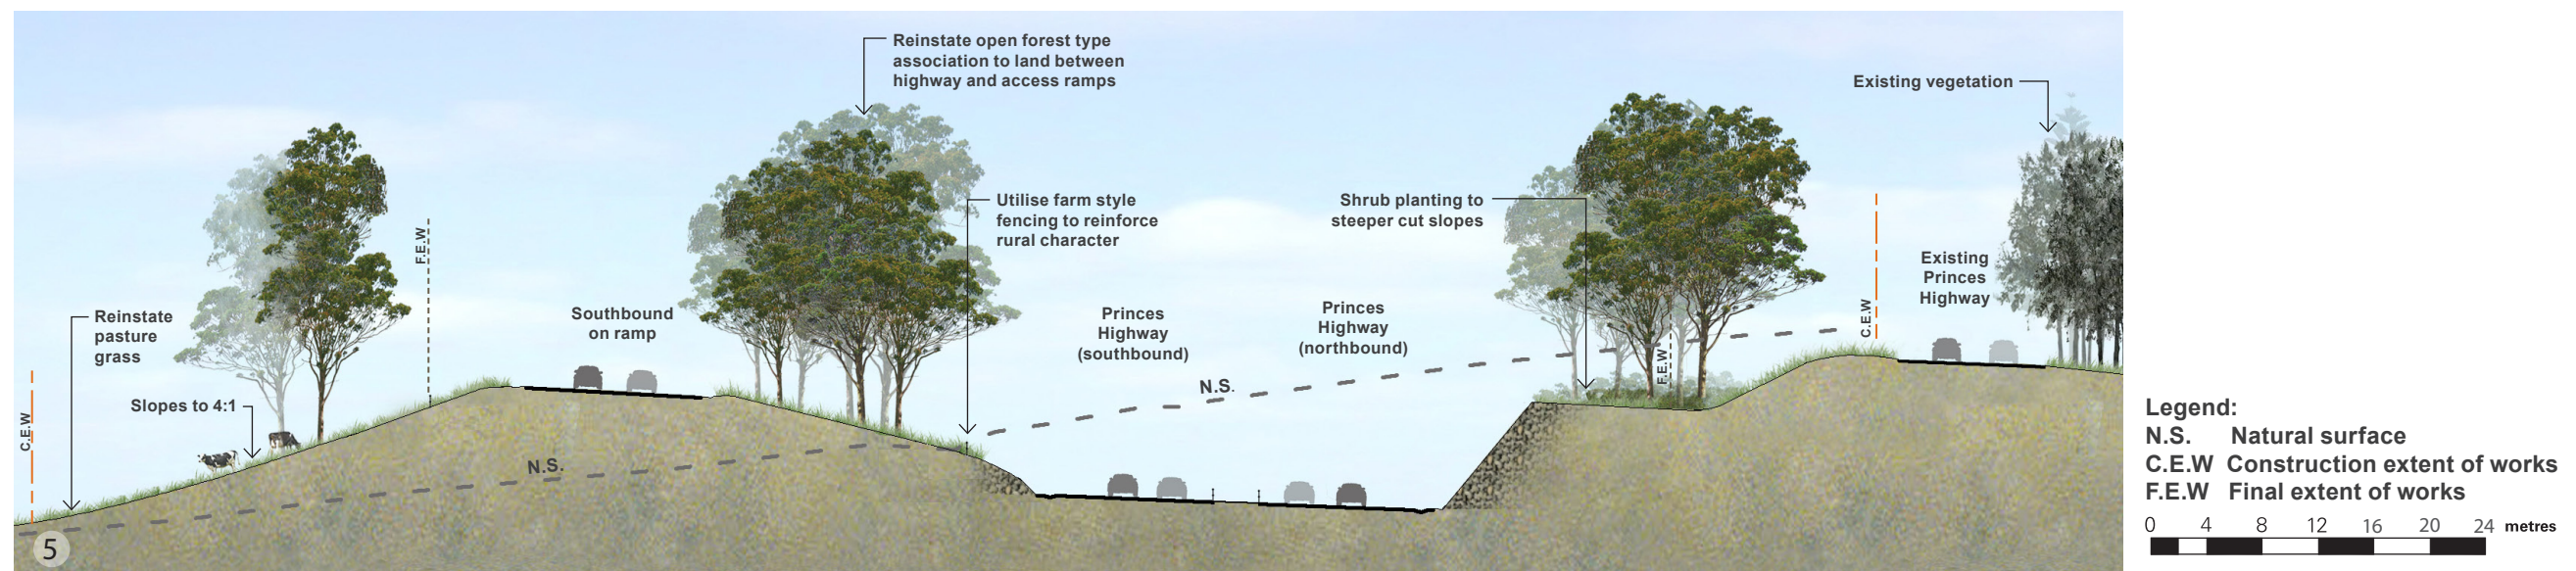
Elevation / Section 5 - North Berry - Chainage 11600
